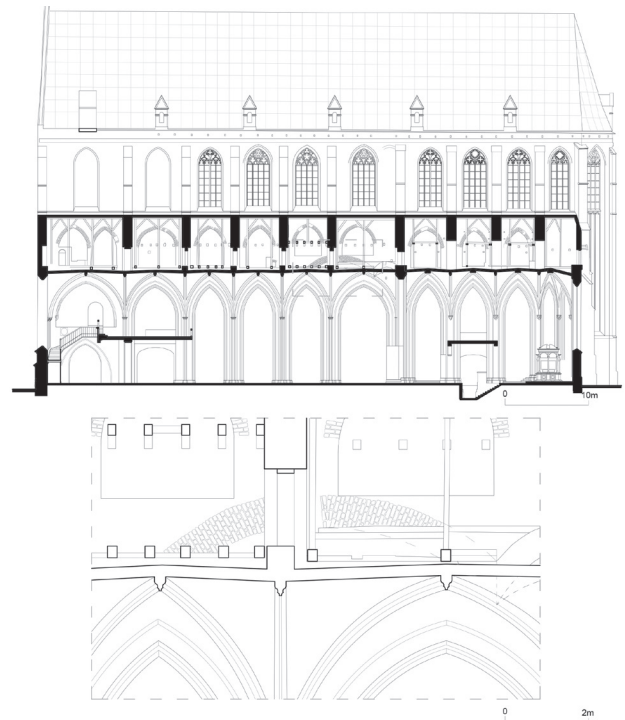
The structural arch in the southern arcade wall on the cross-section through the south nave and a detail of the arch (elaborated by F. Hackemer)
